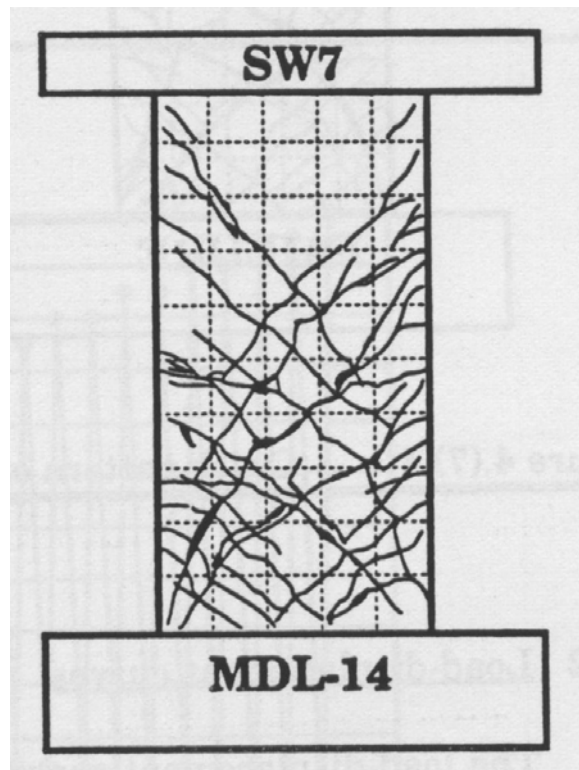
Condition of wall SW7 at 1.17% drift [Pilakoutas (1991)]
